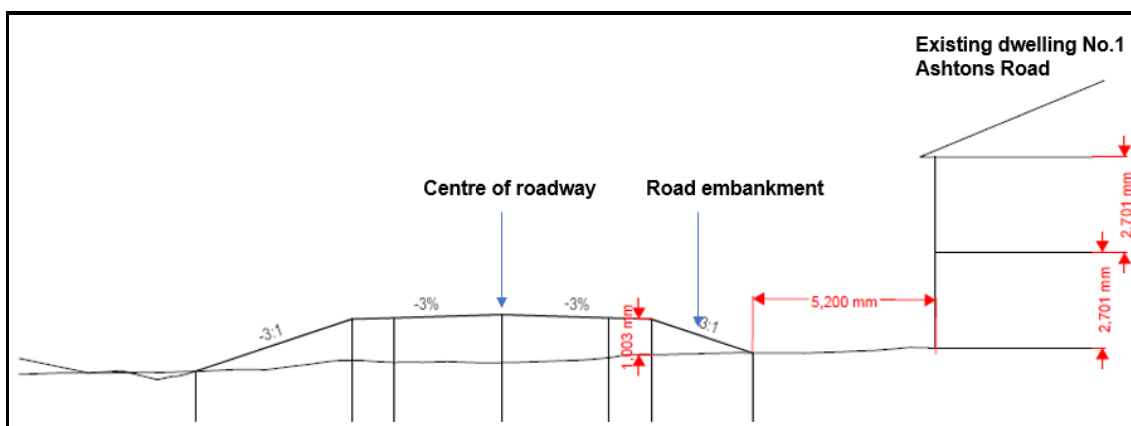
Typical cross-section depicting Option 2 relative to existing dwelling.
